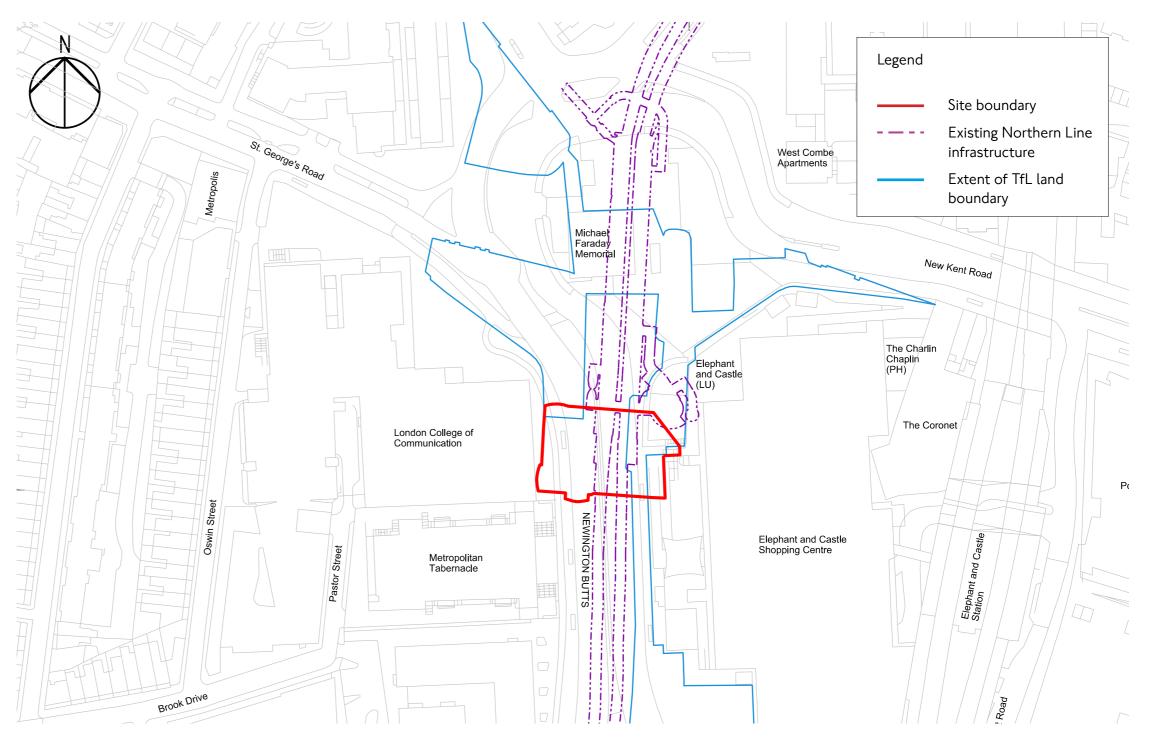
Proposed site location of the red line boundary for the passenger link tunnels in relation to the approved Delancey development
